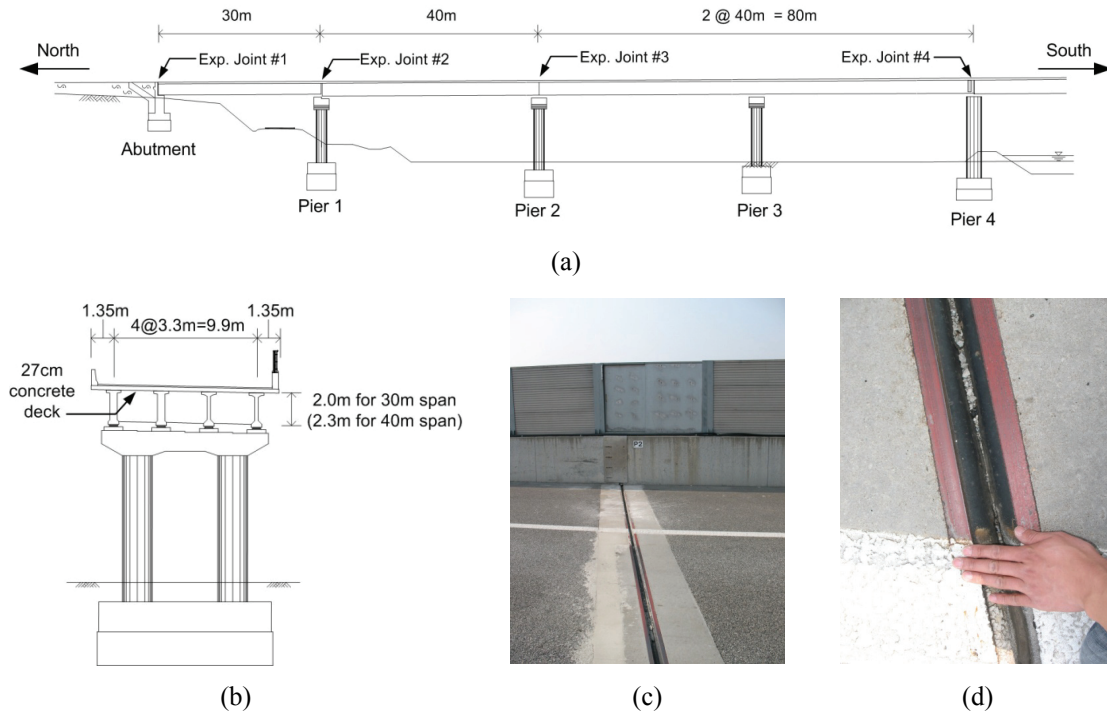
The Geumdang Bridge: (a) profile plan of the northern-most spans of the bridge; (b) cross-section profile; (c) expansion joint typical between adjacent spans; (d) close-up view of the third expansion joint.
